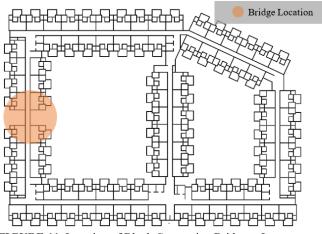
Location of Block Connecting Bridge at Laguna Apartment Source: Authors, 2021
